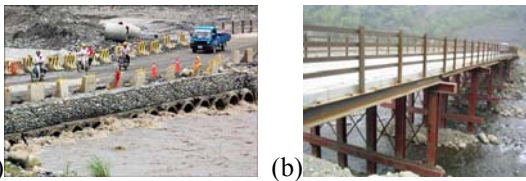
The most commonly used temporary rescue bridges in Taiwan: (a) temporary roadways made from concrete pipes and (b) temporary steel bridges.
